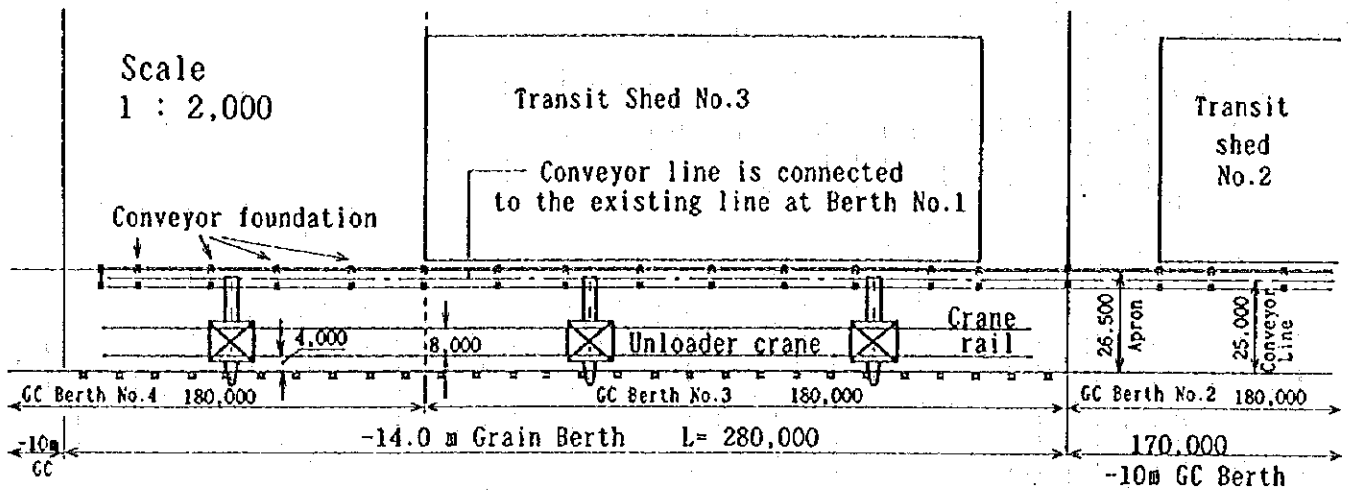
Facility Layout of New Grain Berth at GC Berth No.3
